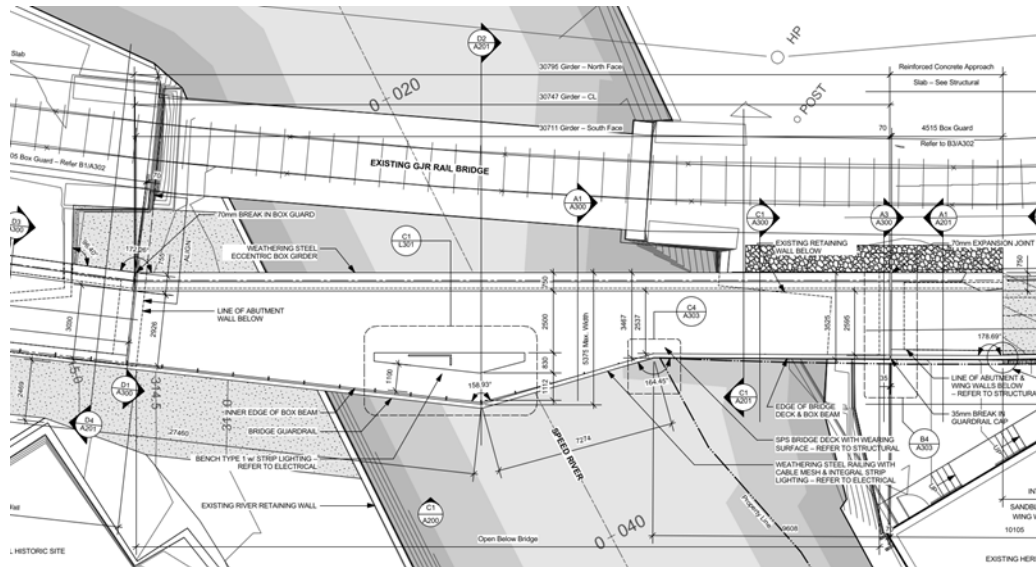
Plan View of 2023 Tendered Architectural Bridge
